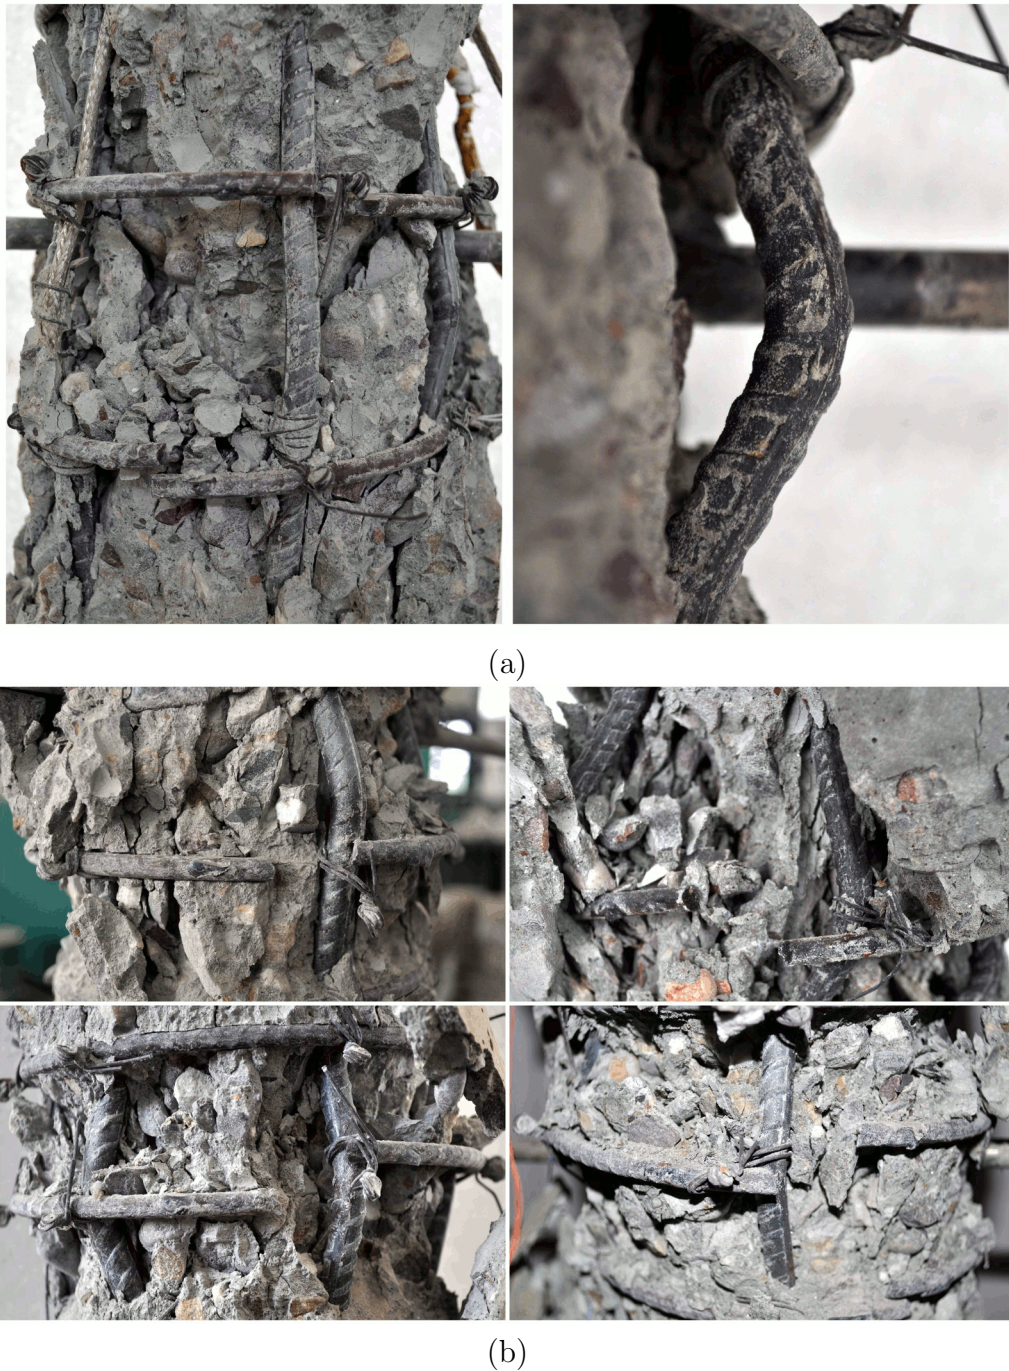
Failure of confined concrete specimens by: (a) Buckling of longitudinal reinforcement (b) Opening of lateral ties
